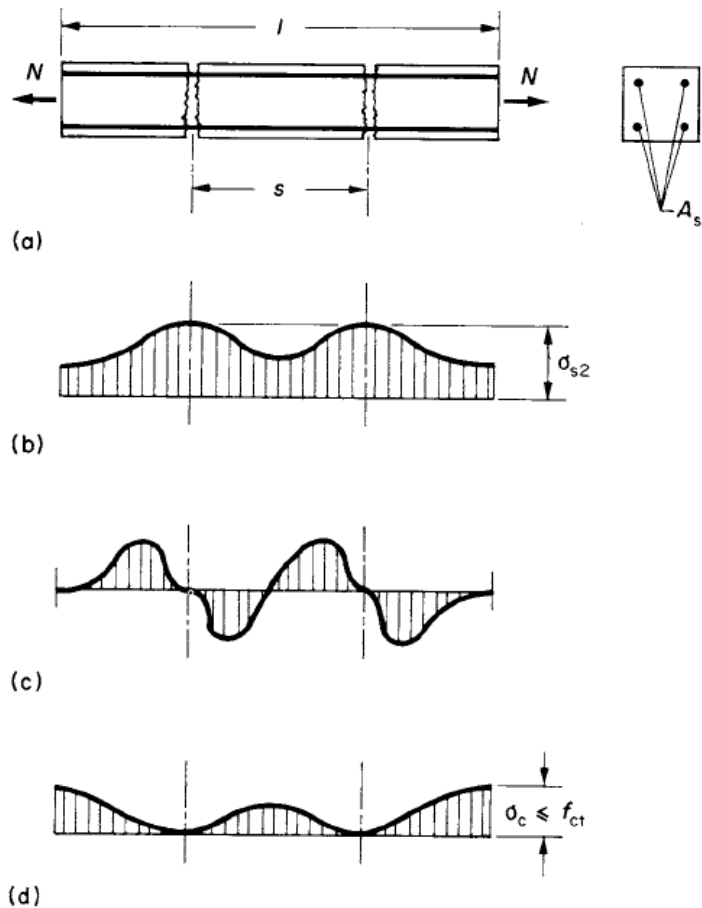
Stresses in a reinforced concrete member cracked due to axial force; (a) cracking of a tie; (b) stress in reinforcement; (c) bond stress; (d) stress in concrete ( $\sigma_c \leq f_{ct}$ ).
